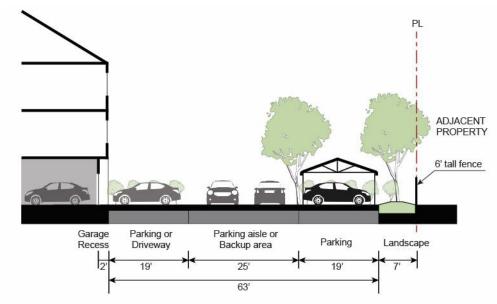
Surface Parking Lot Design Standard at Adjacent Property
